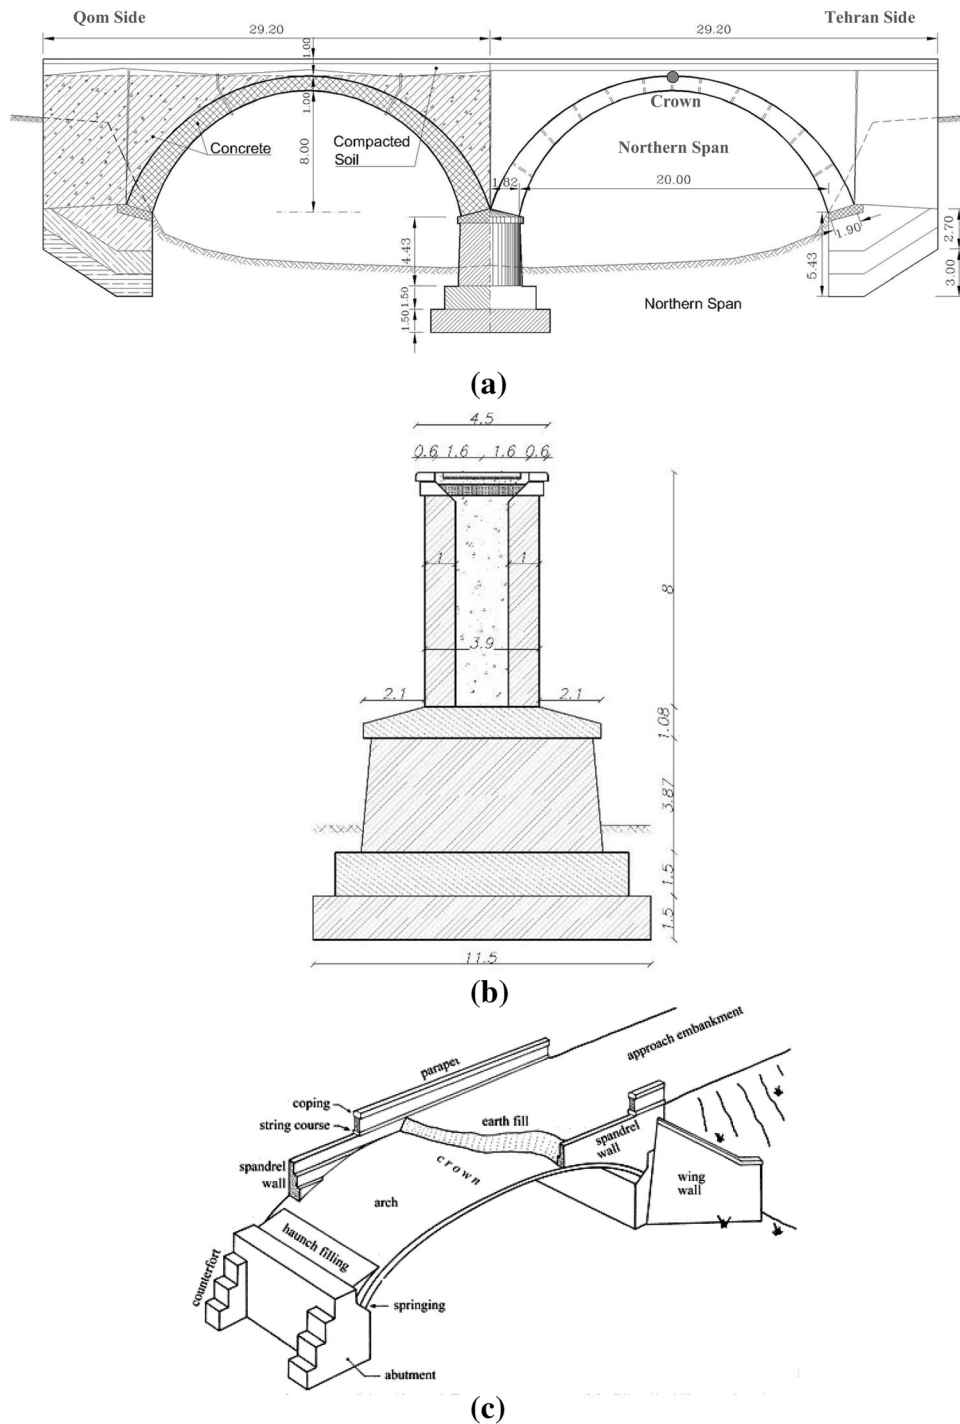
Geometric characteristics of the 2PL20 bridge (units are in meter). a longitudinal section, (b) transversal section and (c) structural parts of Plain concrete arch bridges
